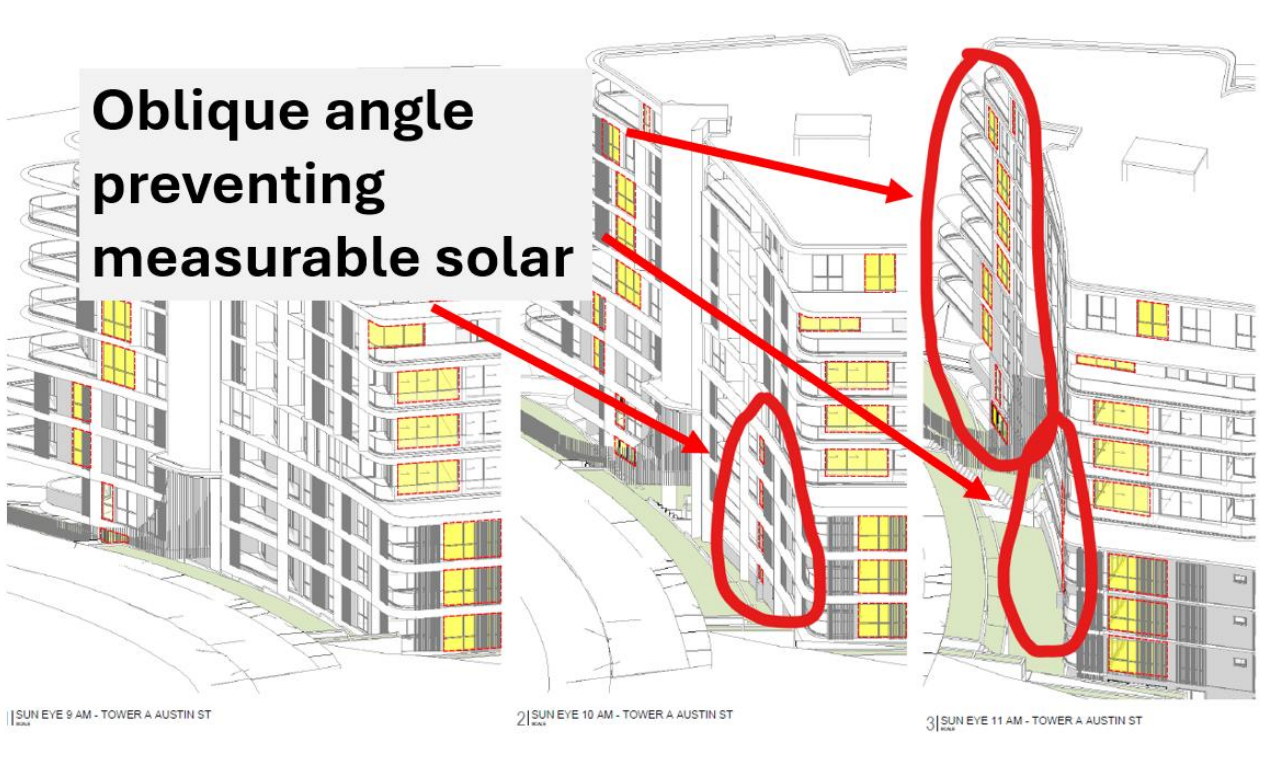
Tower A Austin Street Frontage (Source: Updated Architectural Diagrams – DA9036)
